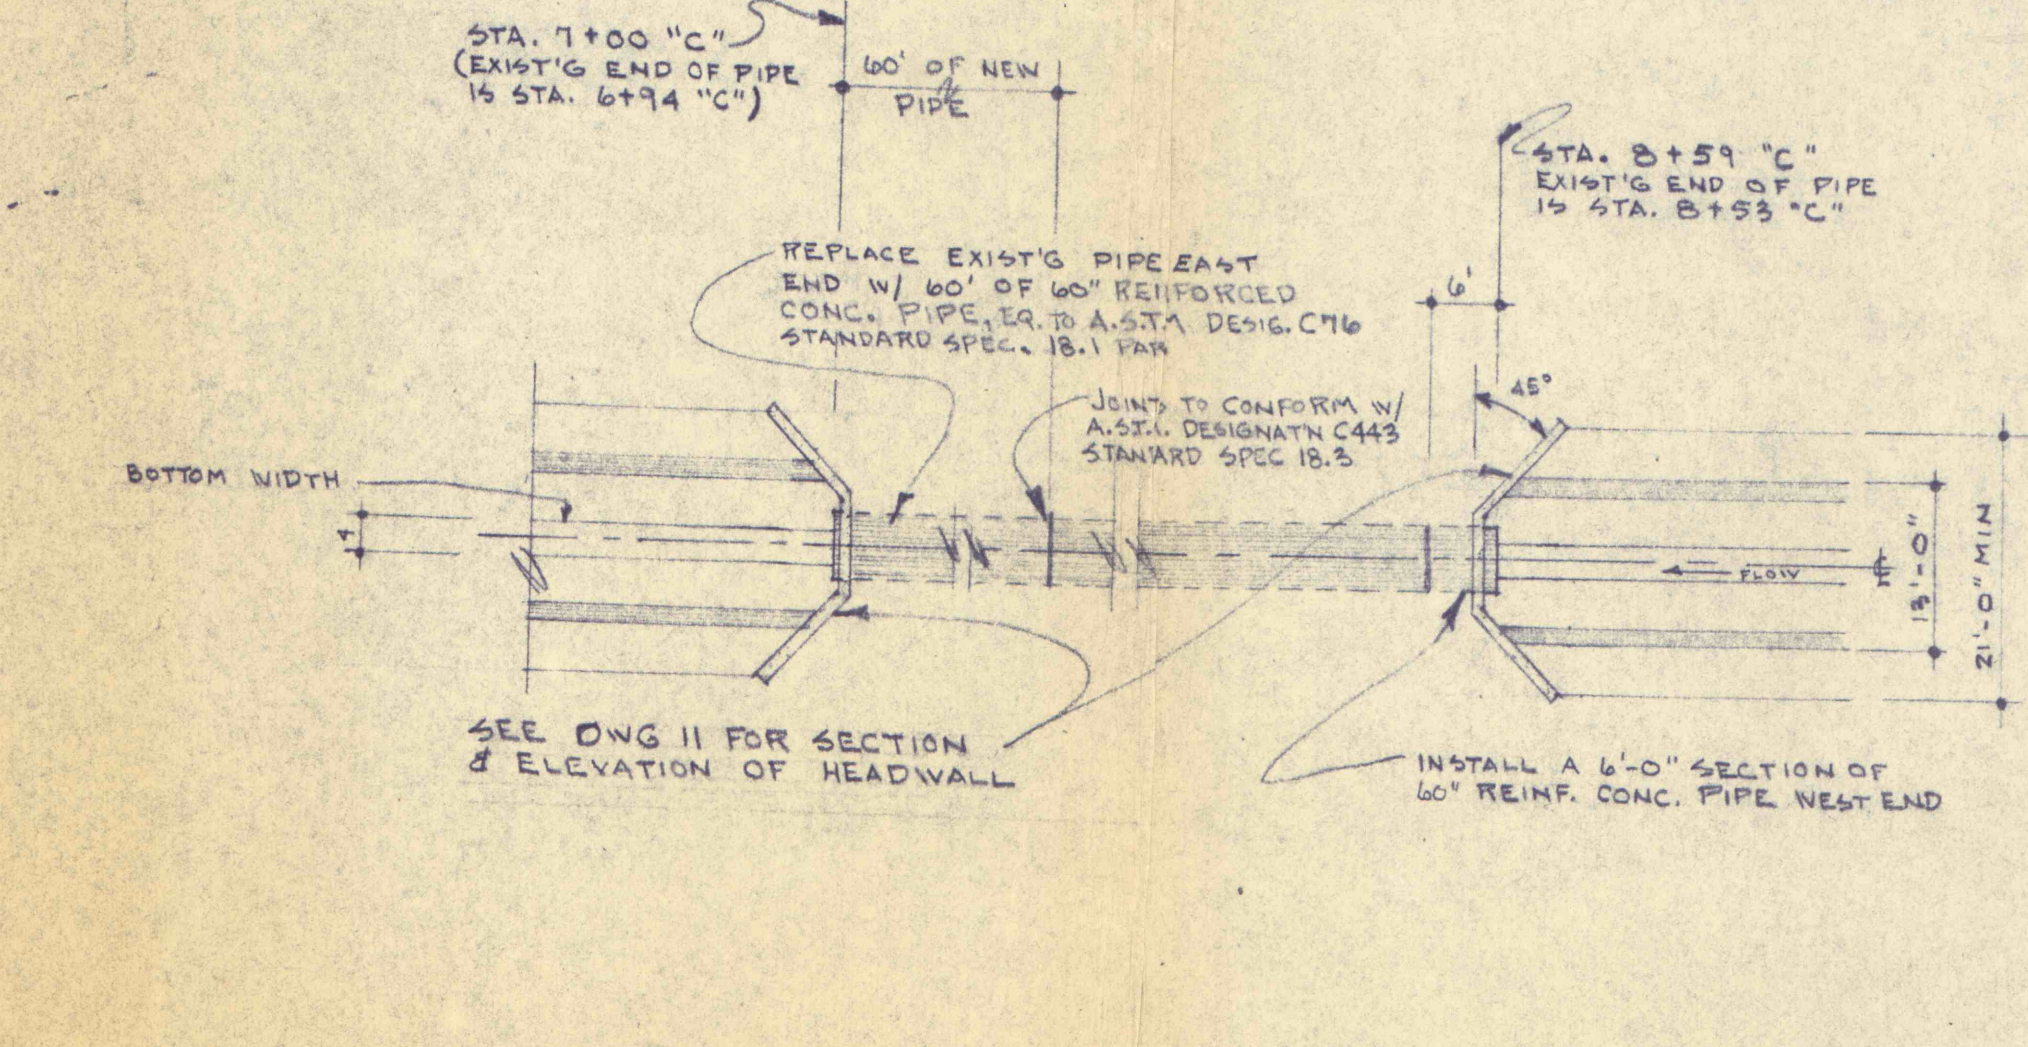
DETAIL OF CONNECTION DITCH "A" WITH DITCH "C" - (K)
